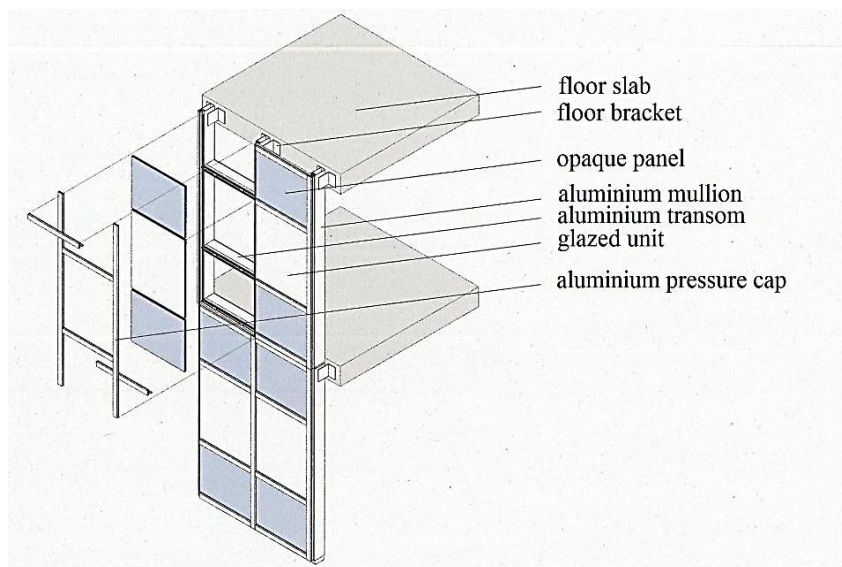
A stick-system curtain wall and erection process. (Roberts and Guariento, 2009).
